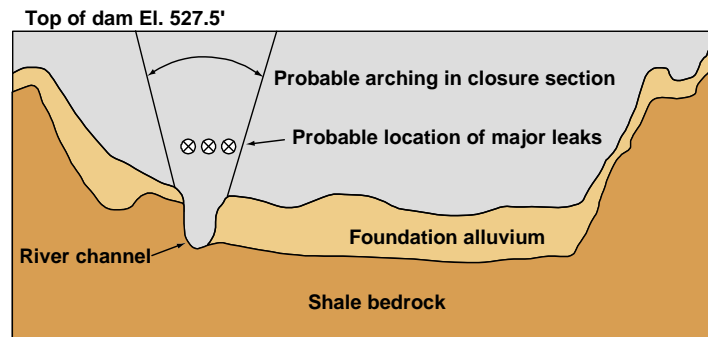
Cross section A-A from figure B-82. Profile along centerline of embankment viewed upstream.
